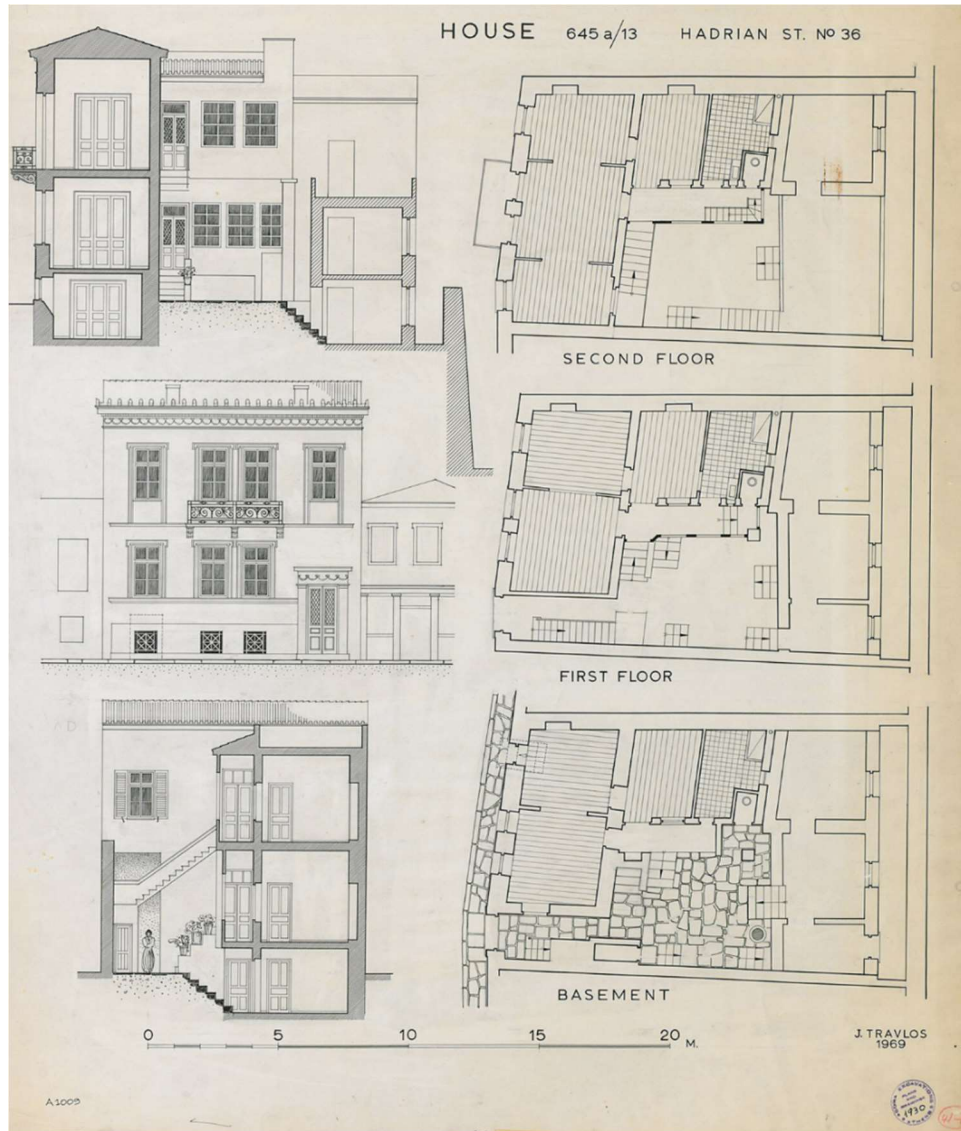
36 Hadrian Street floor plans (north approximately to left of plans), EW section (top left), NS section (bottom left), and north elevation by John Travlos, 1969. Agora Excavation Archives DA 1009.
